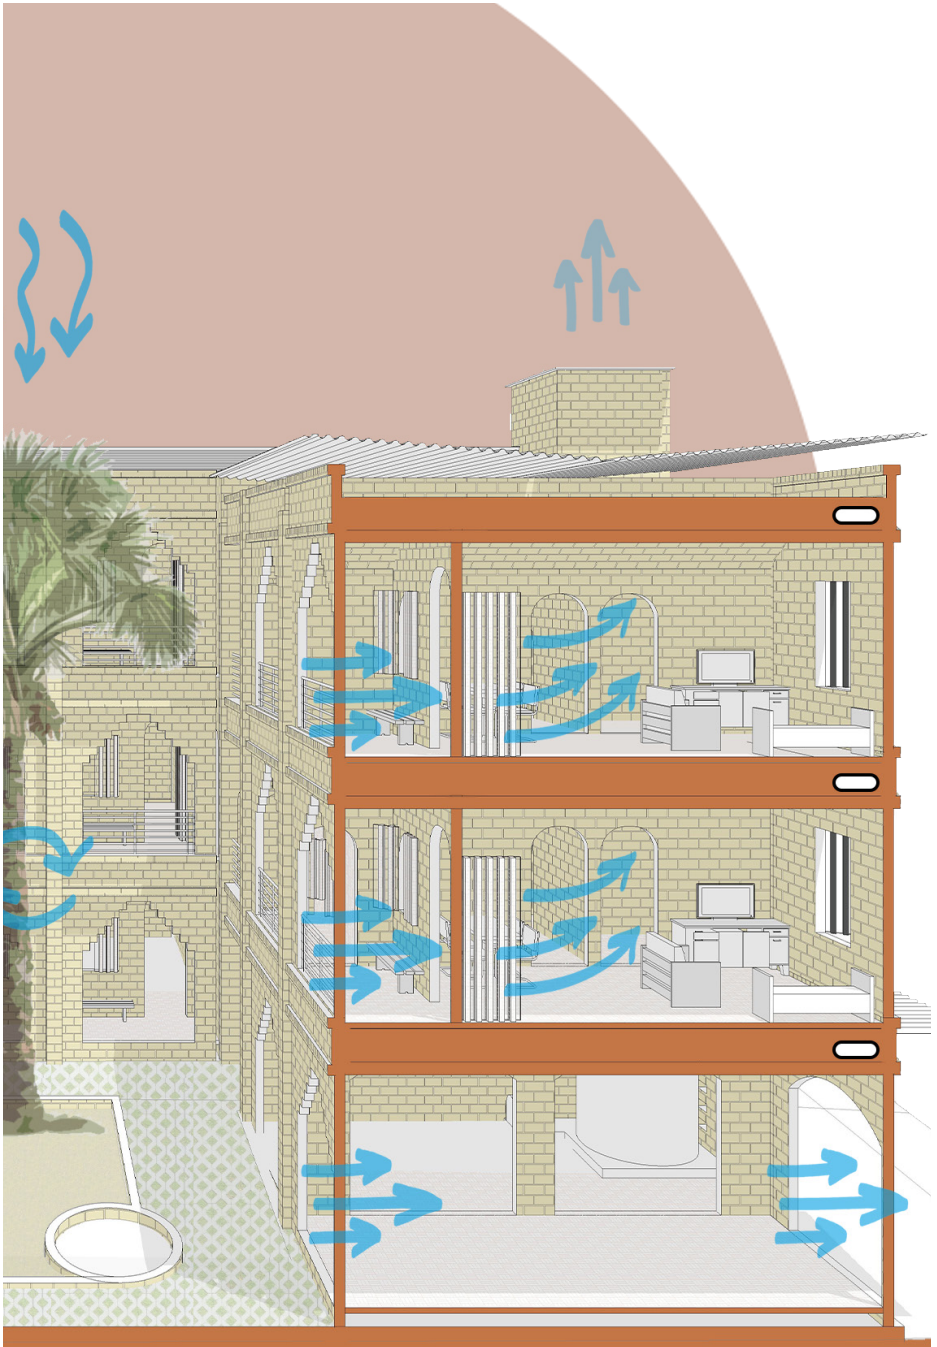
Ventilation Concept in Section [Scale 1:100]
